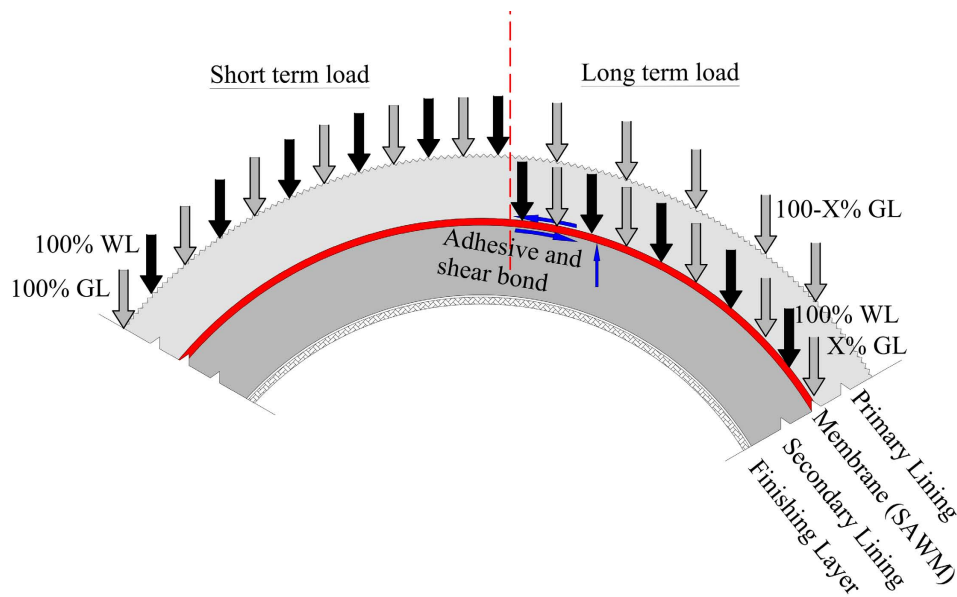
Typical cross-section and loading configuration of a composite shell lining.
